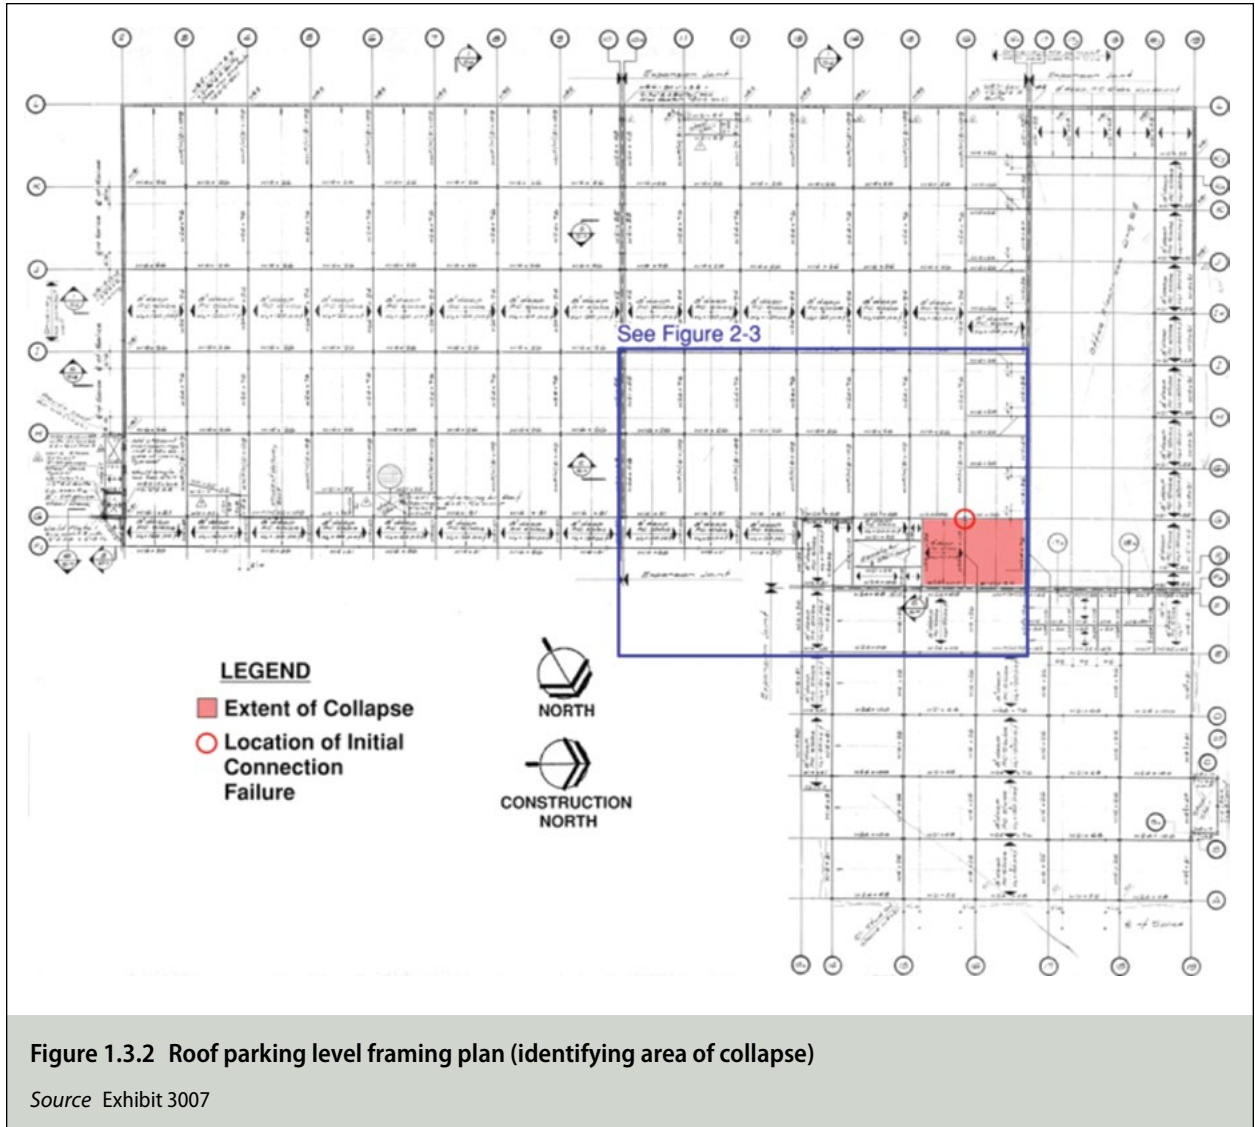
Roof parking level framing plan (identifying area of collapse)
